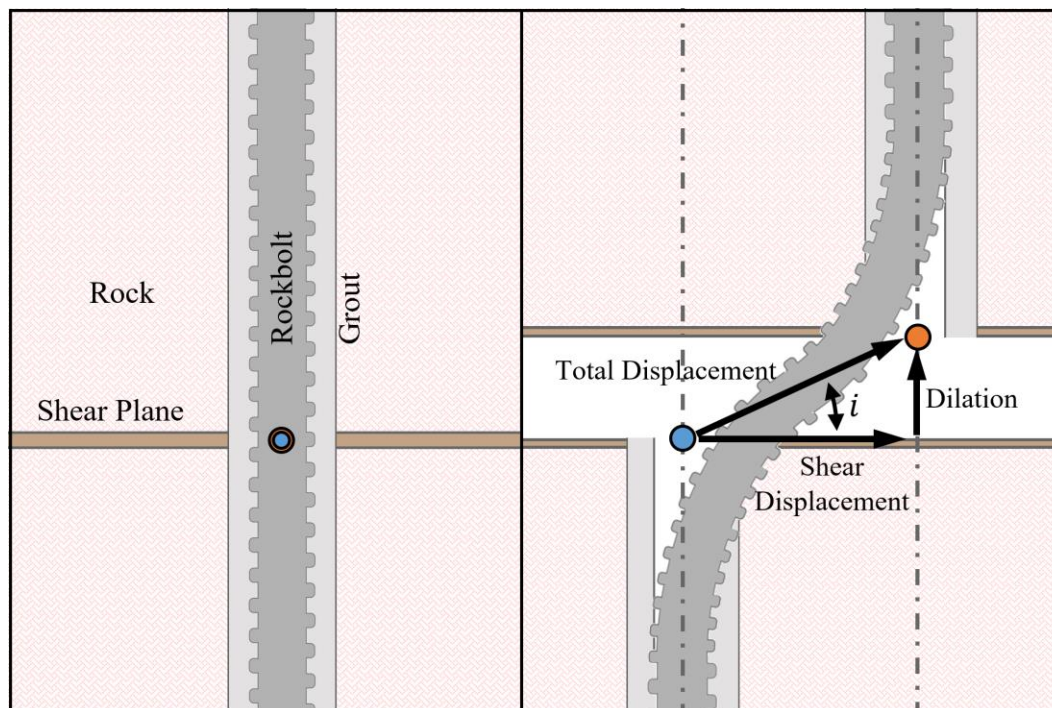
Fully-grouted rebar at installation (left) and after shear plane dilation in combination with shear movement (right)
